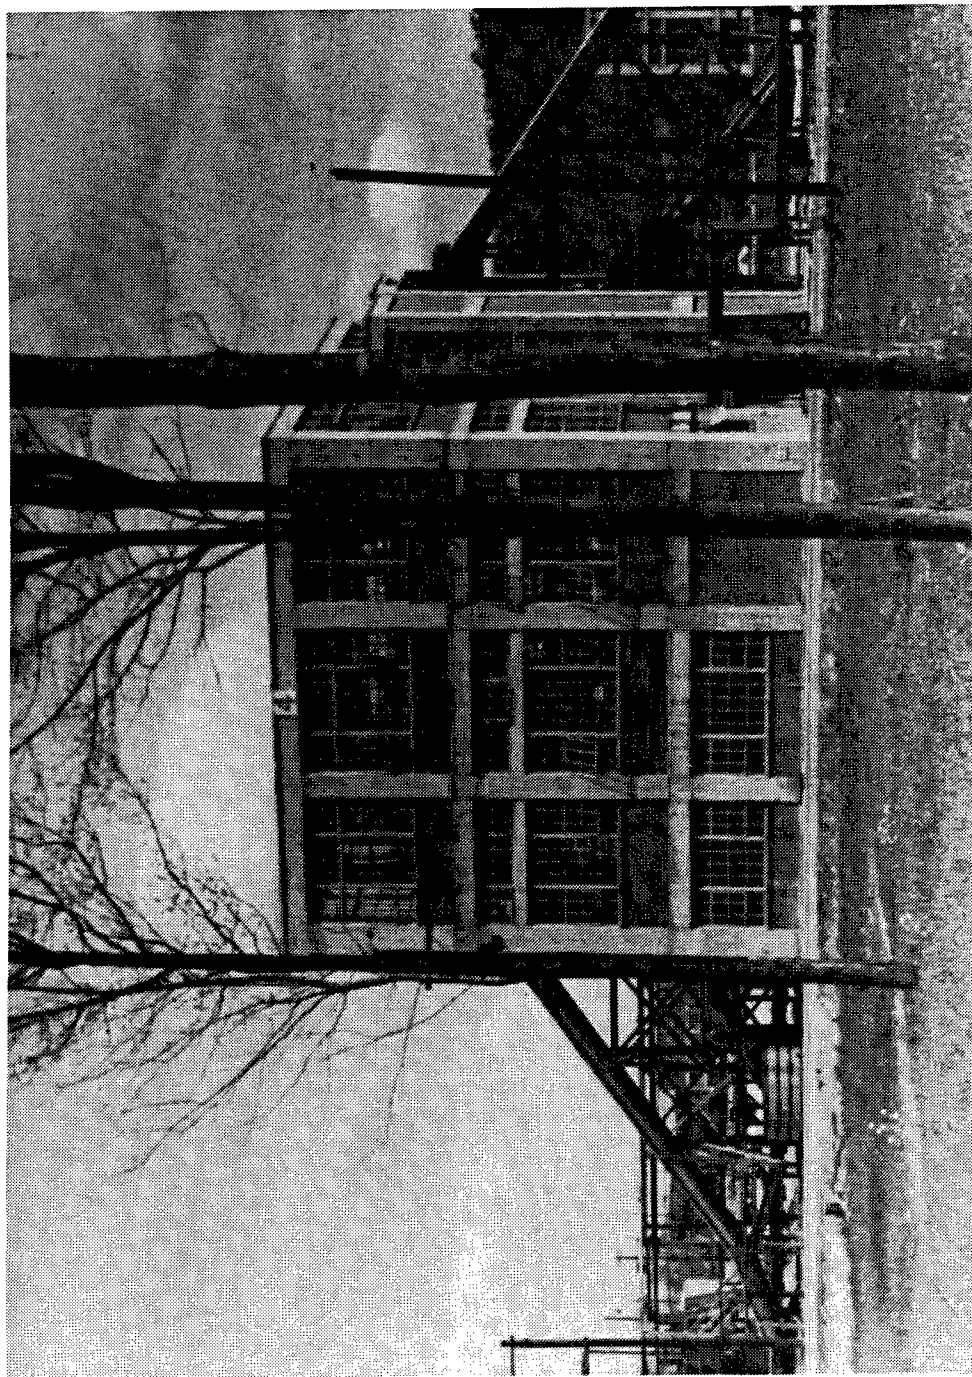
Purification, G Building, Area B (courtesy of Holston AAP Photo Set No. 23-B [on file Engineering Vault, Building 26]).
